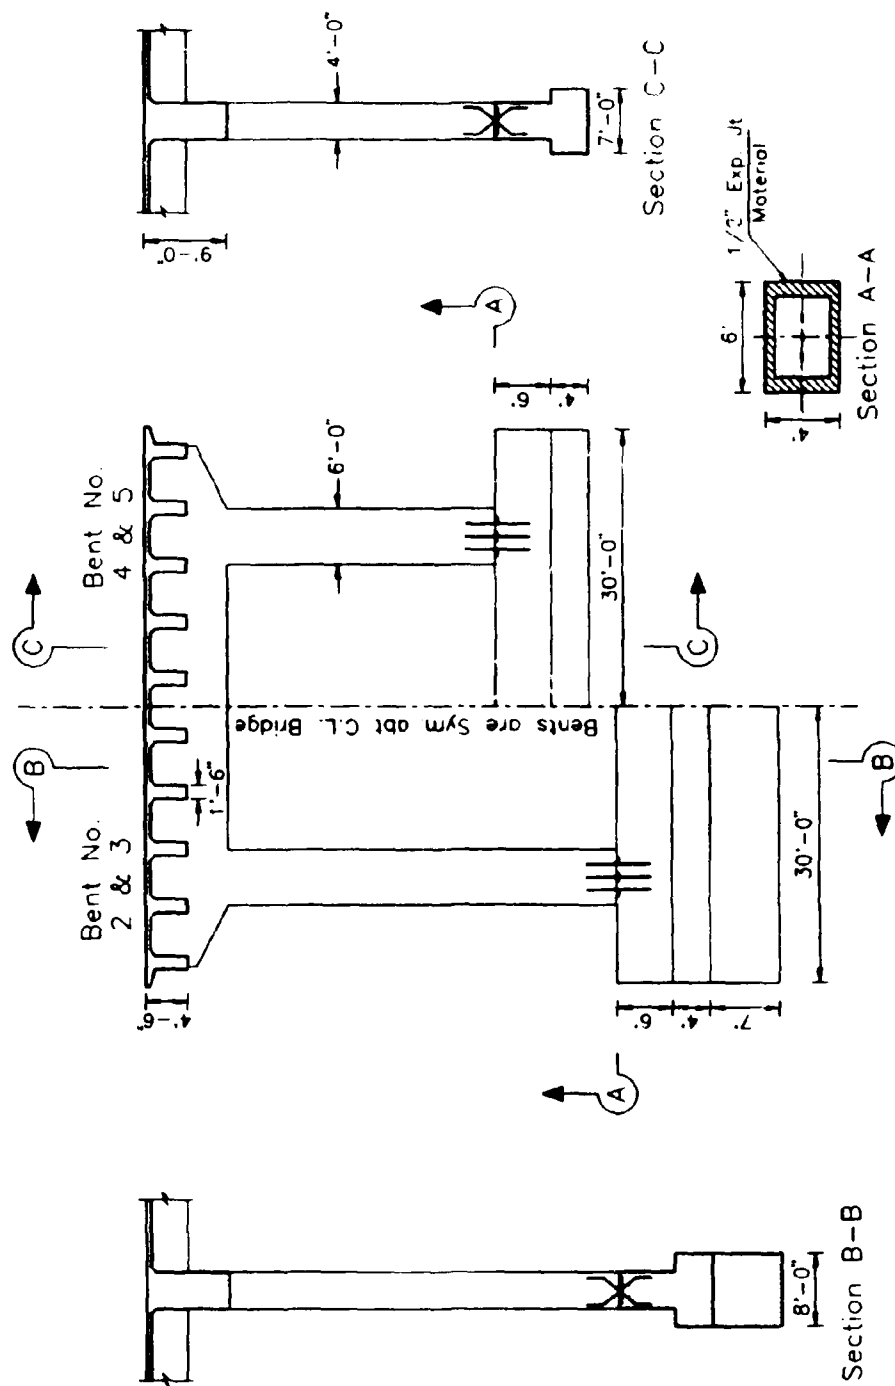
Cross Sections of the Aptos Creek Bridge.
